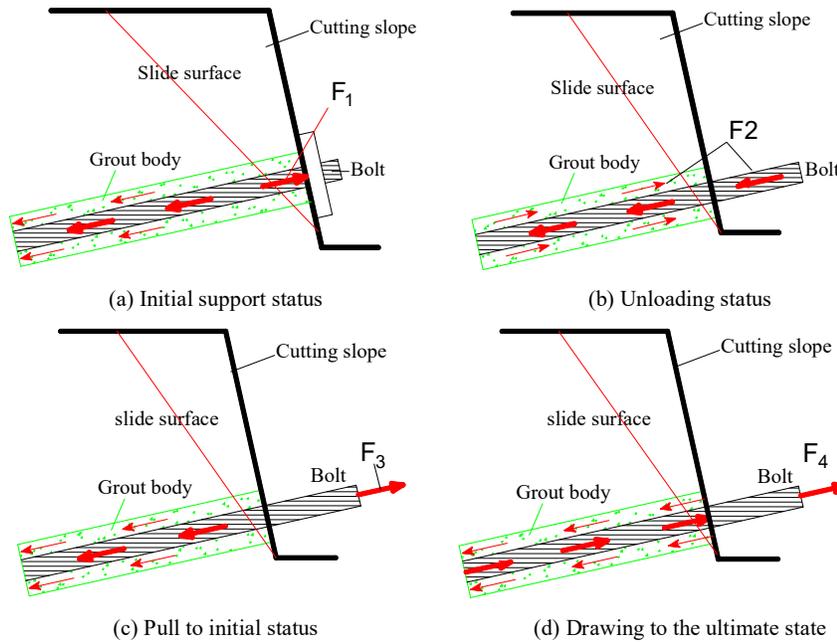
Bolt pull-out mechanism: (a) initial support status; (b) unloading status; (c) pull to initial status; (d) drawing to the ultimate state.
